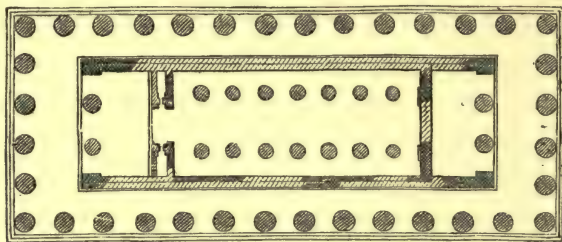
Ground-plan of the Temple of Poseidon at Pæstum.
